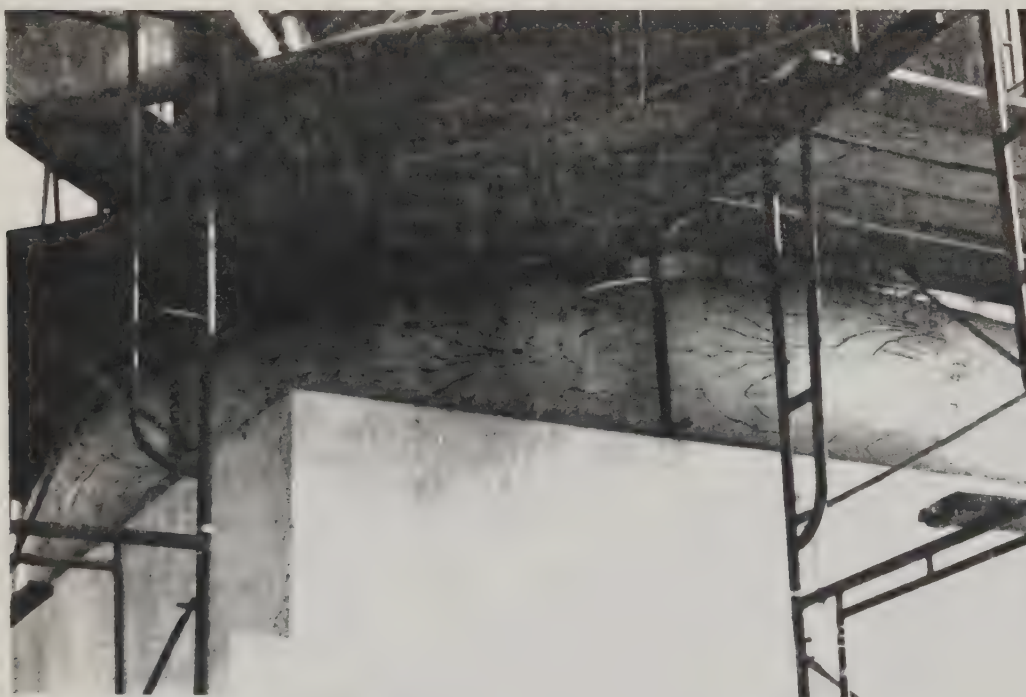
Photo Astoria Column Detail of Wraith-AUG 1989
